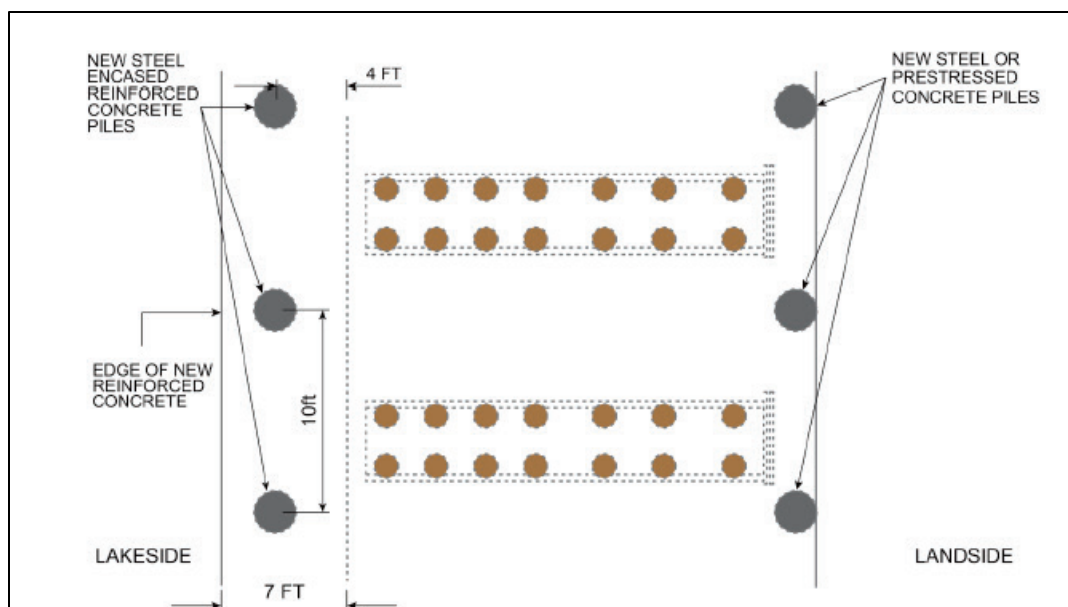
Plan view of proposed repairs for encased timber pile sections.
